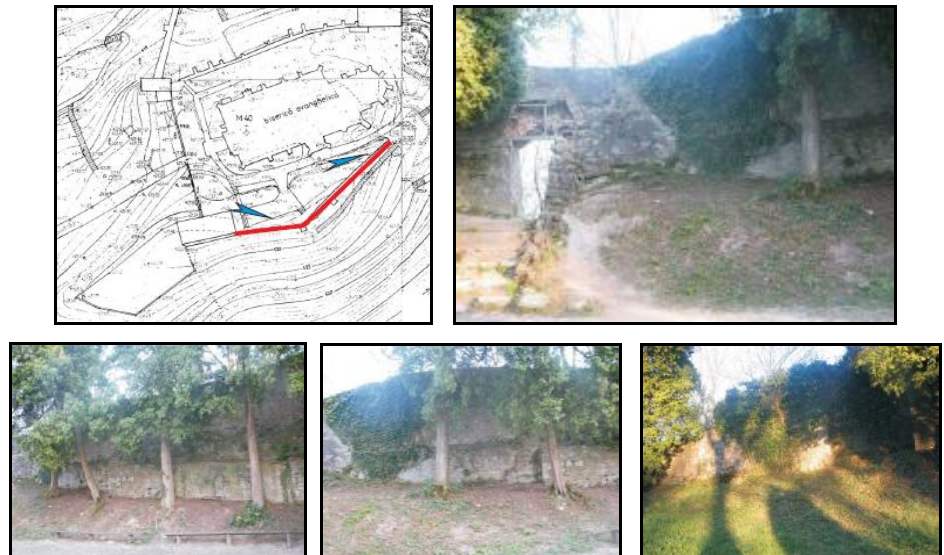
The fortress wall – Section 19, Plan and images, 2007
